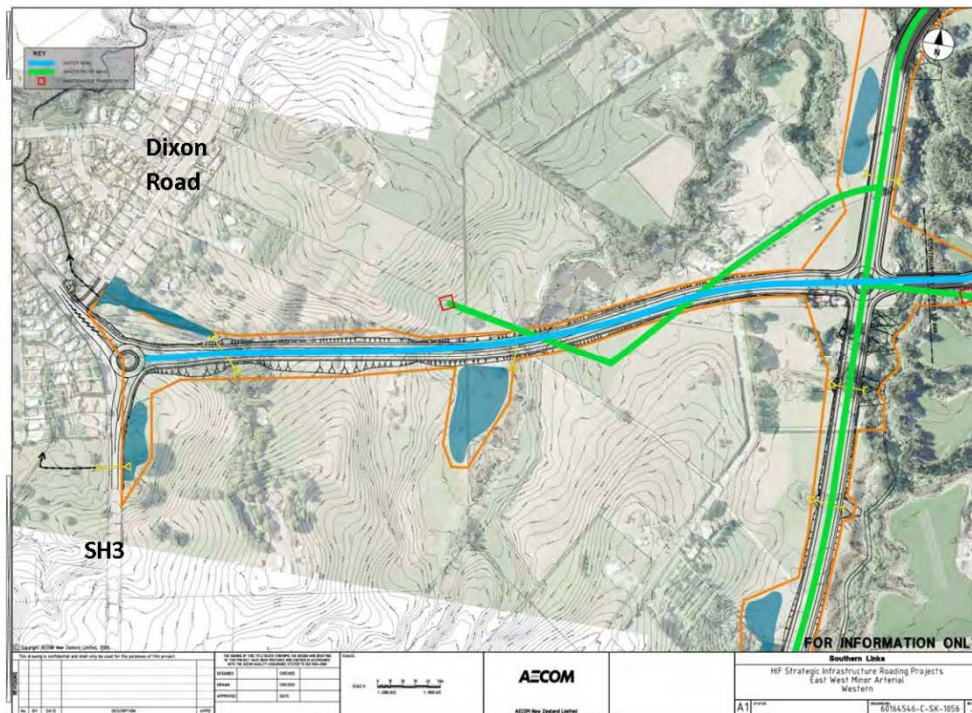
East-West arterial roads and SH3 roundabout Connection, water and wastewater
